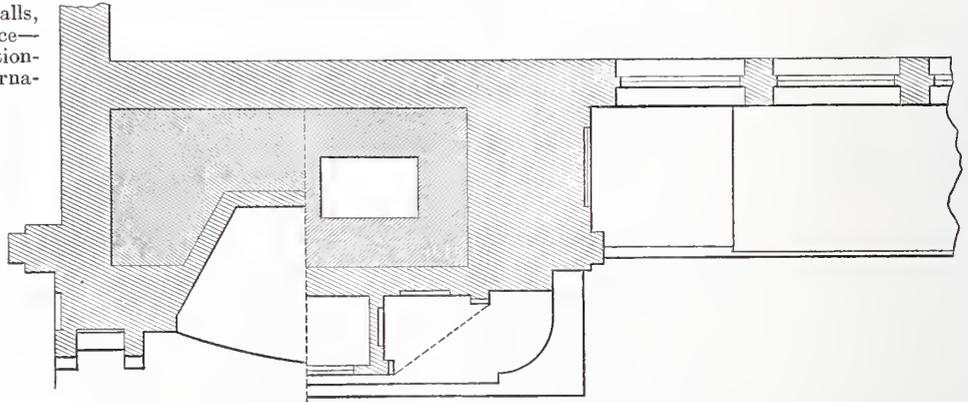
Plan of Design A.—Scale, 1/2 Ineh to the Foot.
